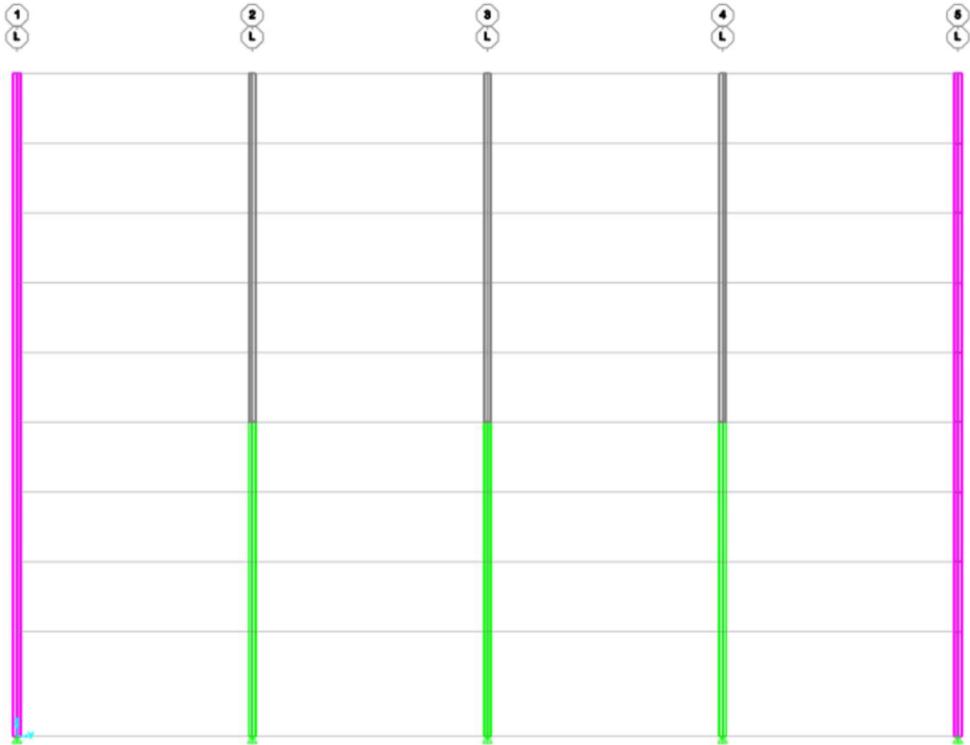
Column cross-section layout in the face L (SAP2000)
